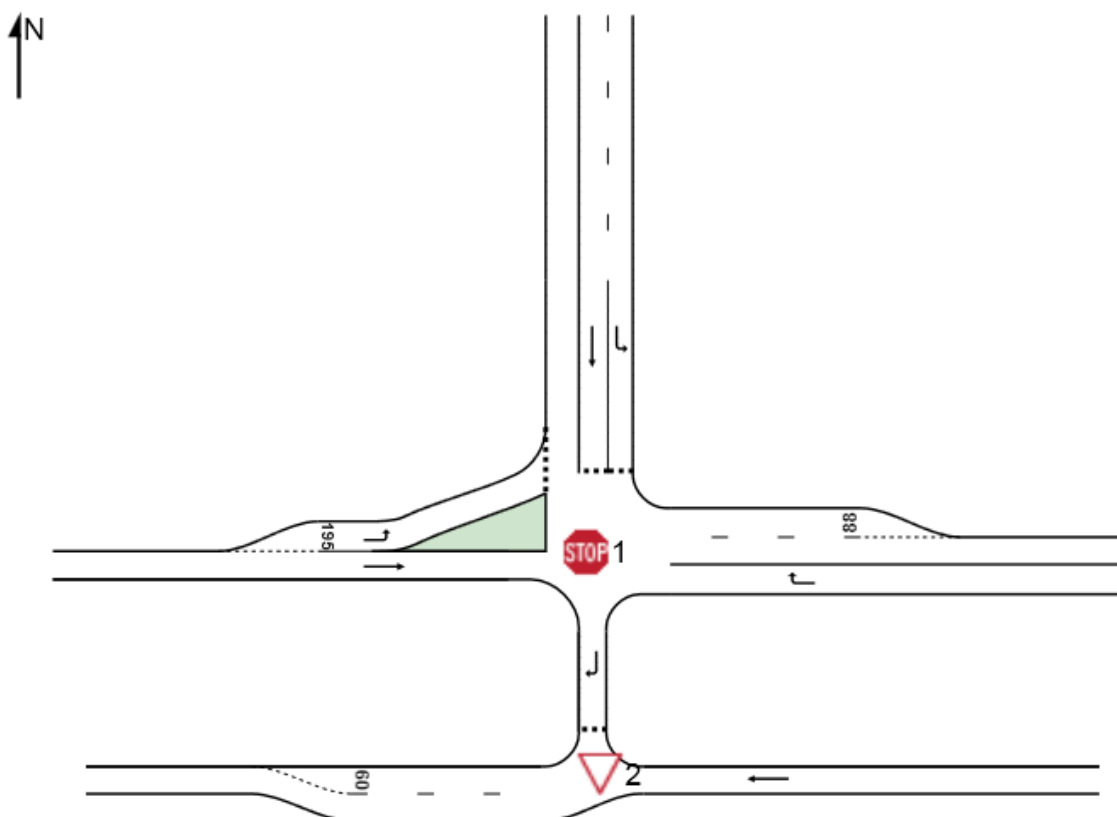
SIDRA Intersection Layout of Ewingsdale Road / Bayshore Drive
